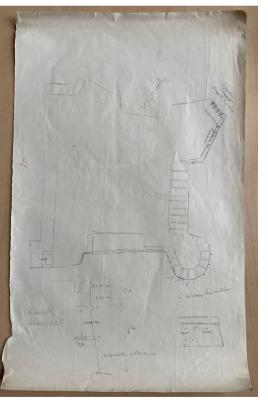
Emile Lachaud de Loqueyssie, *Preliminary*drawing of the ground plan of Fort Blockhouse,
